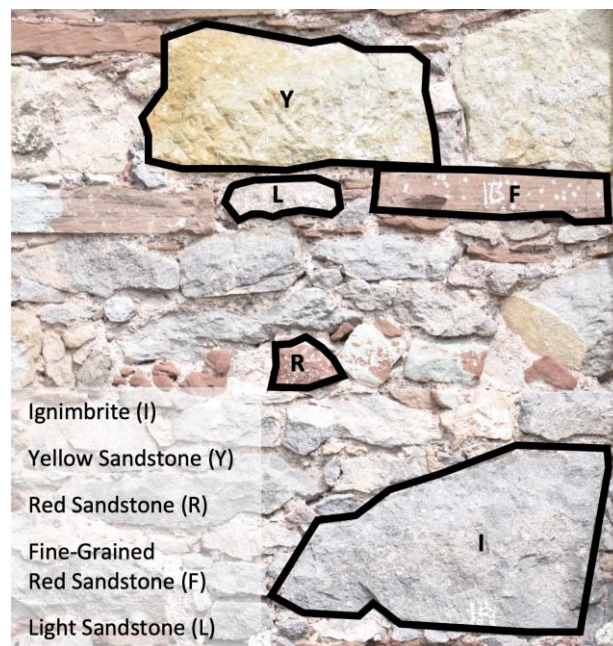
Typical Wall Section Analyzed Using Schmidt Hammer.
